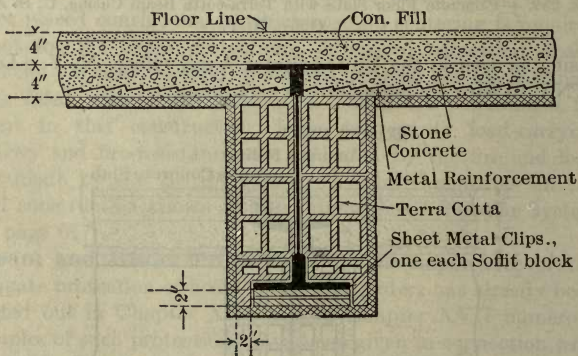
Plate-girder Protection, Proposed Appraisers' Stores, Boston.
